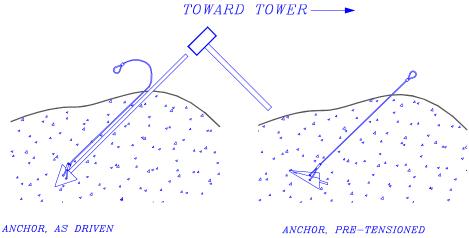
Arrowhead & Duckbill anchor installation diagram
